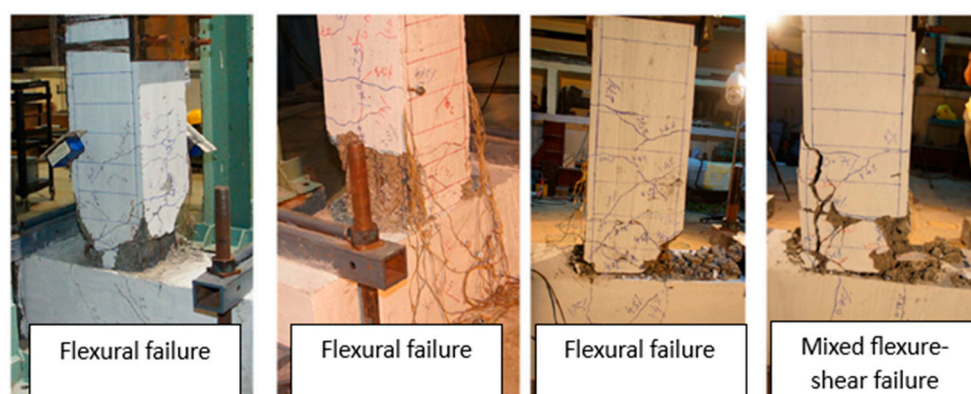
Failure mode for eccentrically loaded CES column, reprinted with permission from [28], 2021, *Journal of Building Engineering*.
